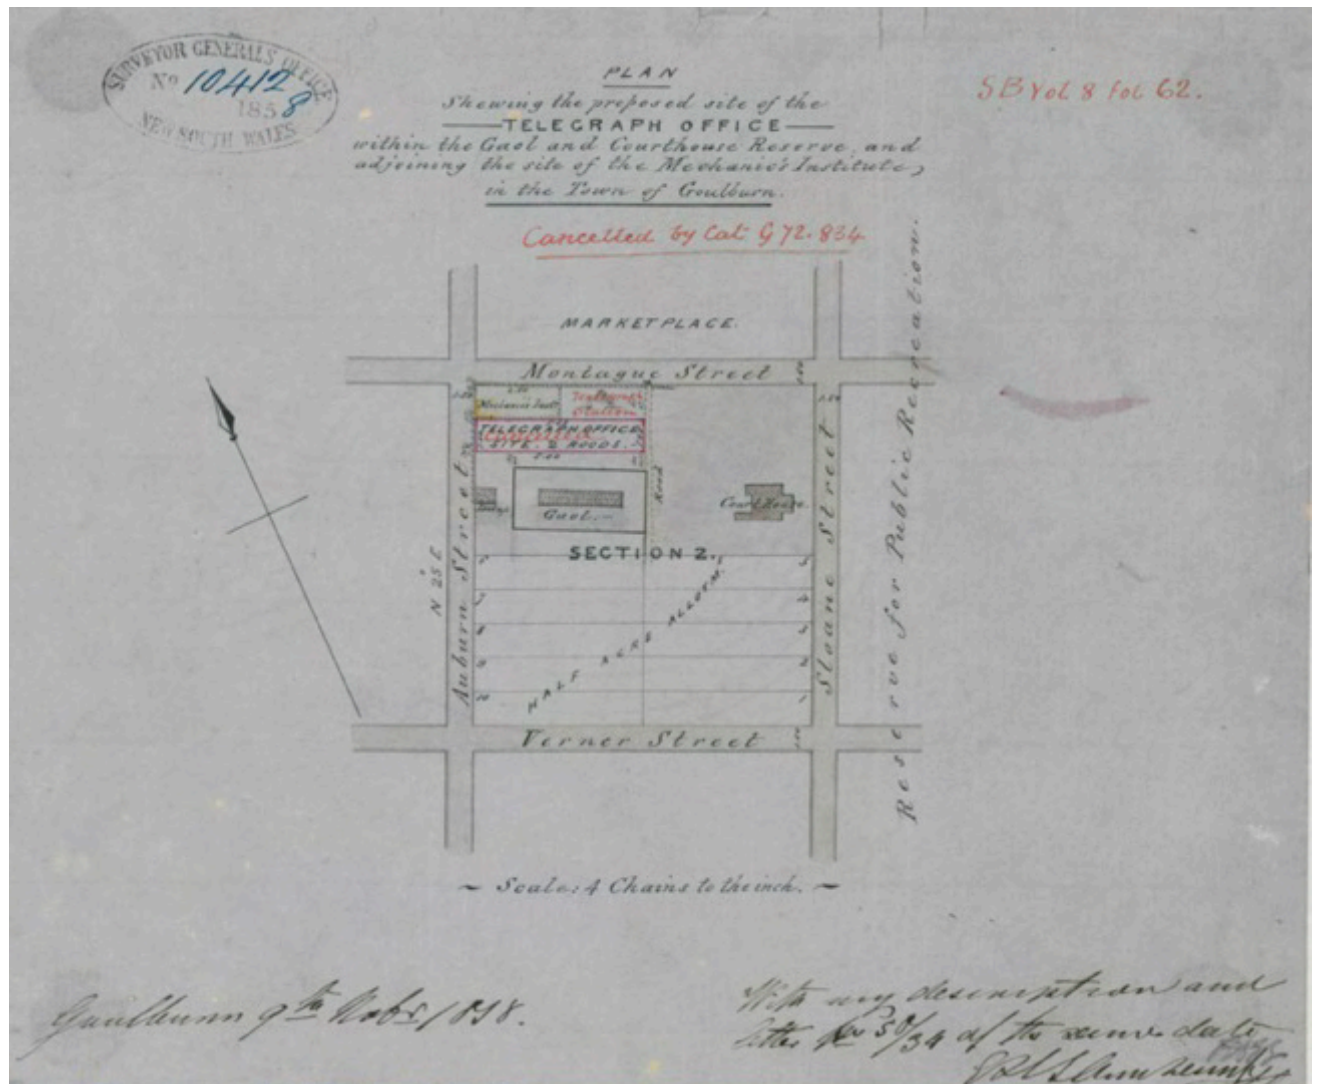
Sketch plan showing possible site for Telegraph Office.
